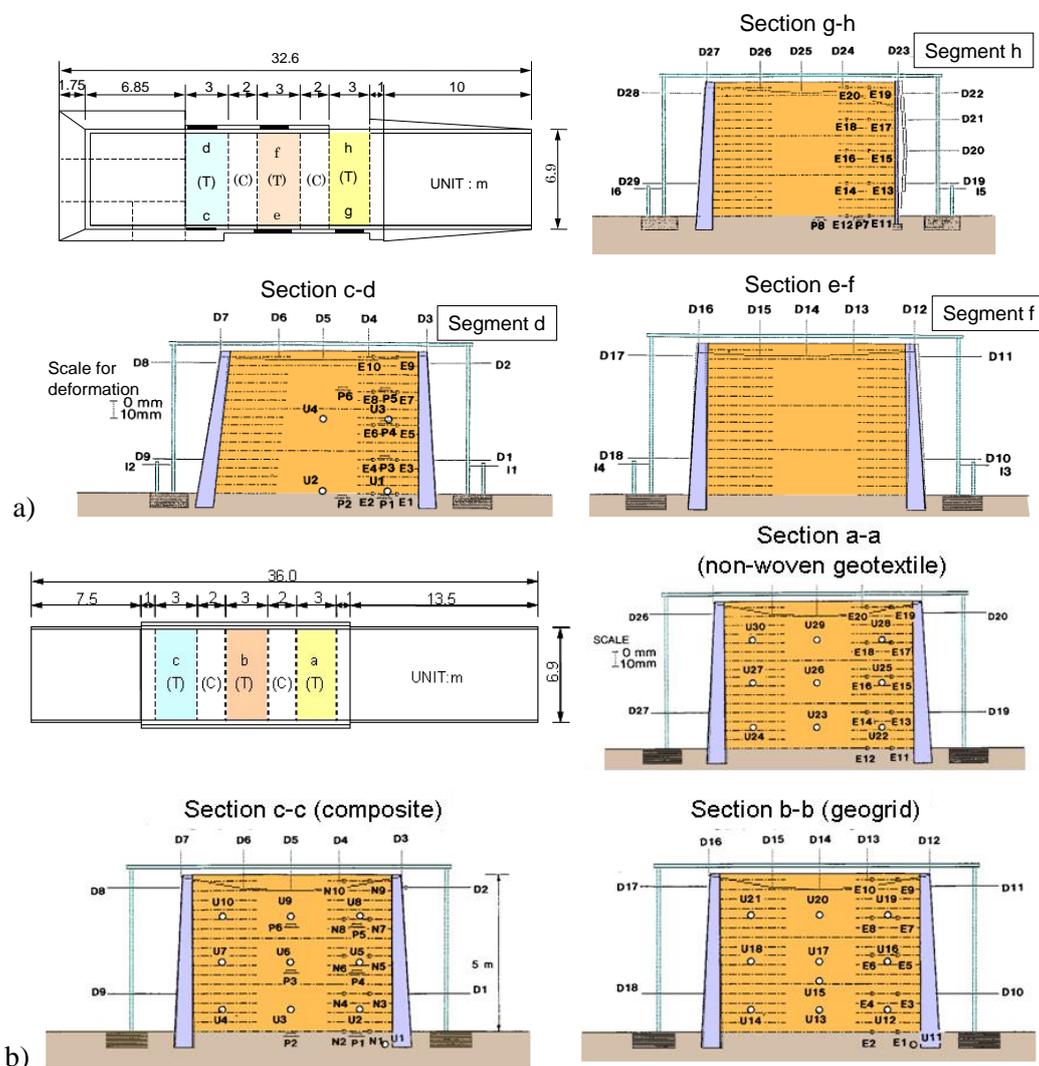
Plan and cross-sections two years after wall construction: a) JR No. 1 test embankment with sand backfill; and b) JR No. 2 test embankment with clayey soil backfill (Tatsuoka et al., 1990, 2000, 2008).
